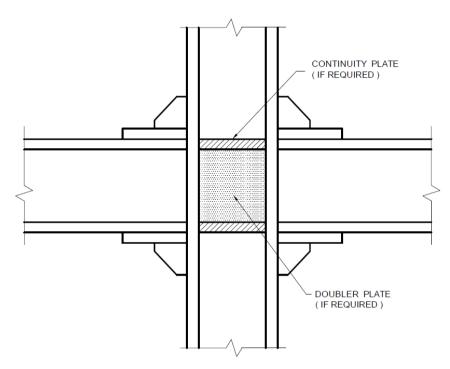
TYPICAL INTERIOR REINFORCED BEAM-COLUMN JOINT
